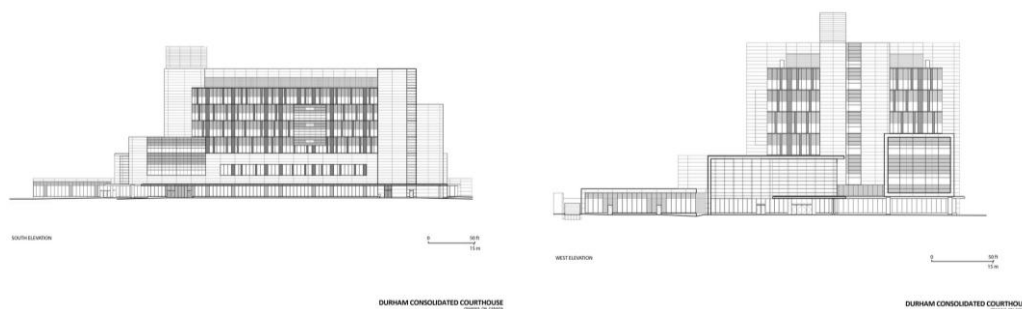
South and west elevation of the Courthouse (www.architectural.com)
